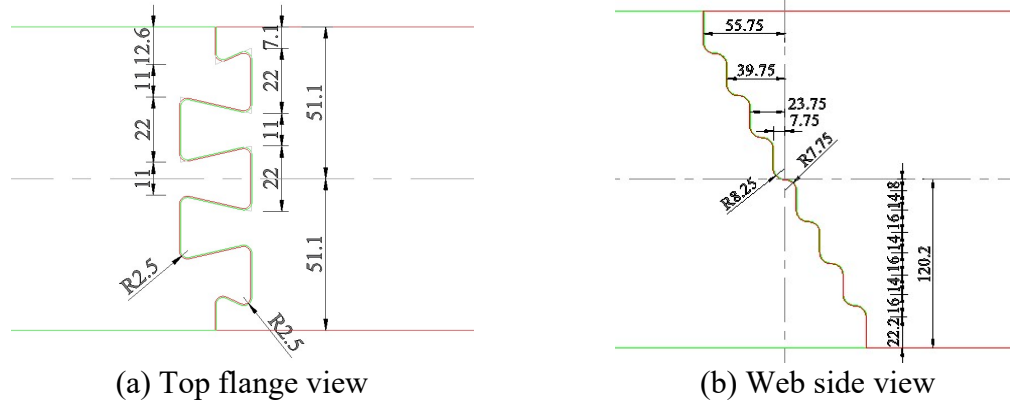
Detailed design of the cuts in the intermeshed connection (dimensions in millimeters)
